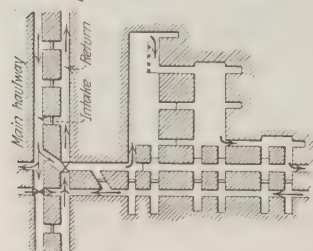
GENERAL PLAN, SHOWING DOUBLE 50-FT. ROOMS
